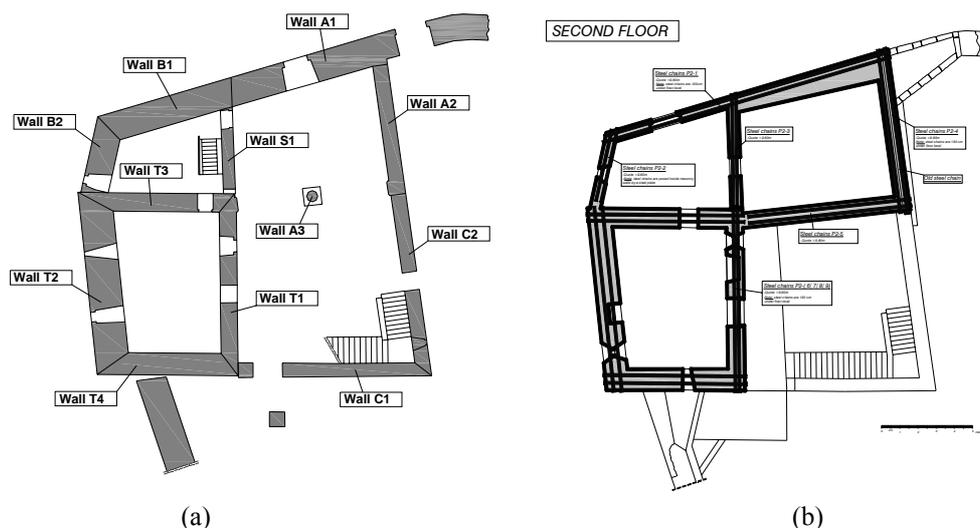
(a) Elementary walls; (b) Steel chains on second floor
